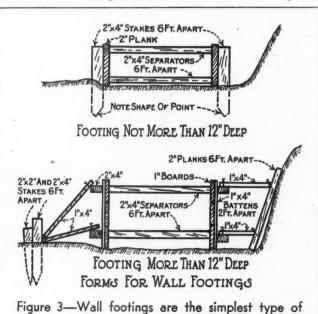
Wall footings are the simplest type of forms, yet they require proper bracing and good construction according to the details above.
